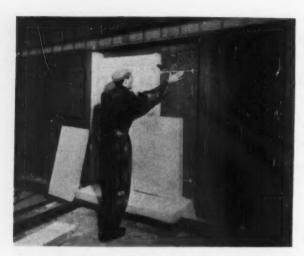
Building-up the lagging on the underside of the girder prior to laying it on the ground. This was necessary for the first two girders only.
